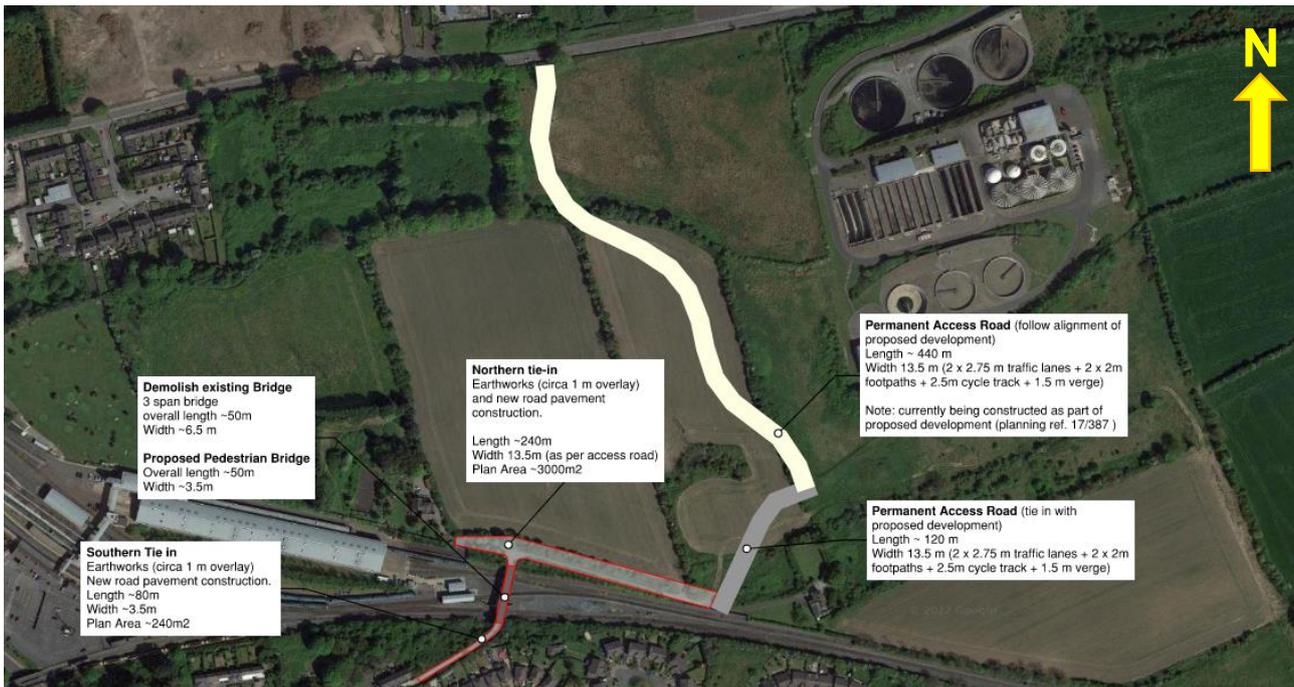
Option 5 – Pedestrian bridge with alternative access road from the north
